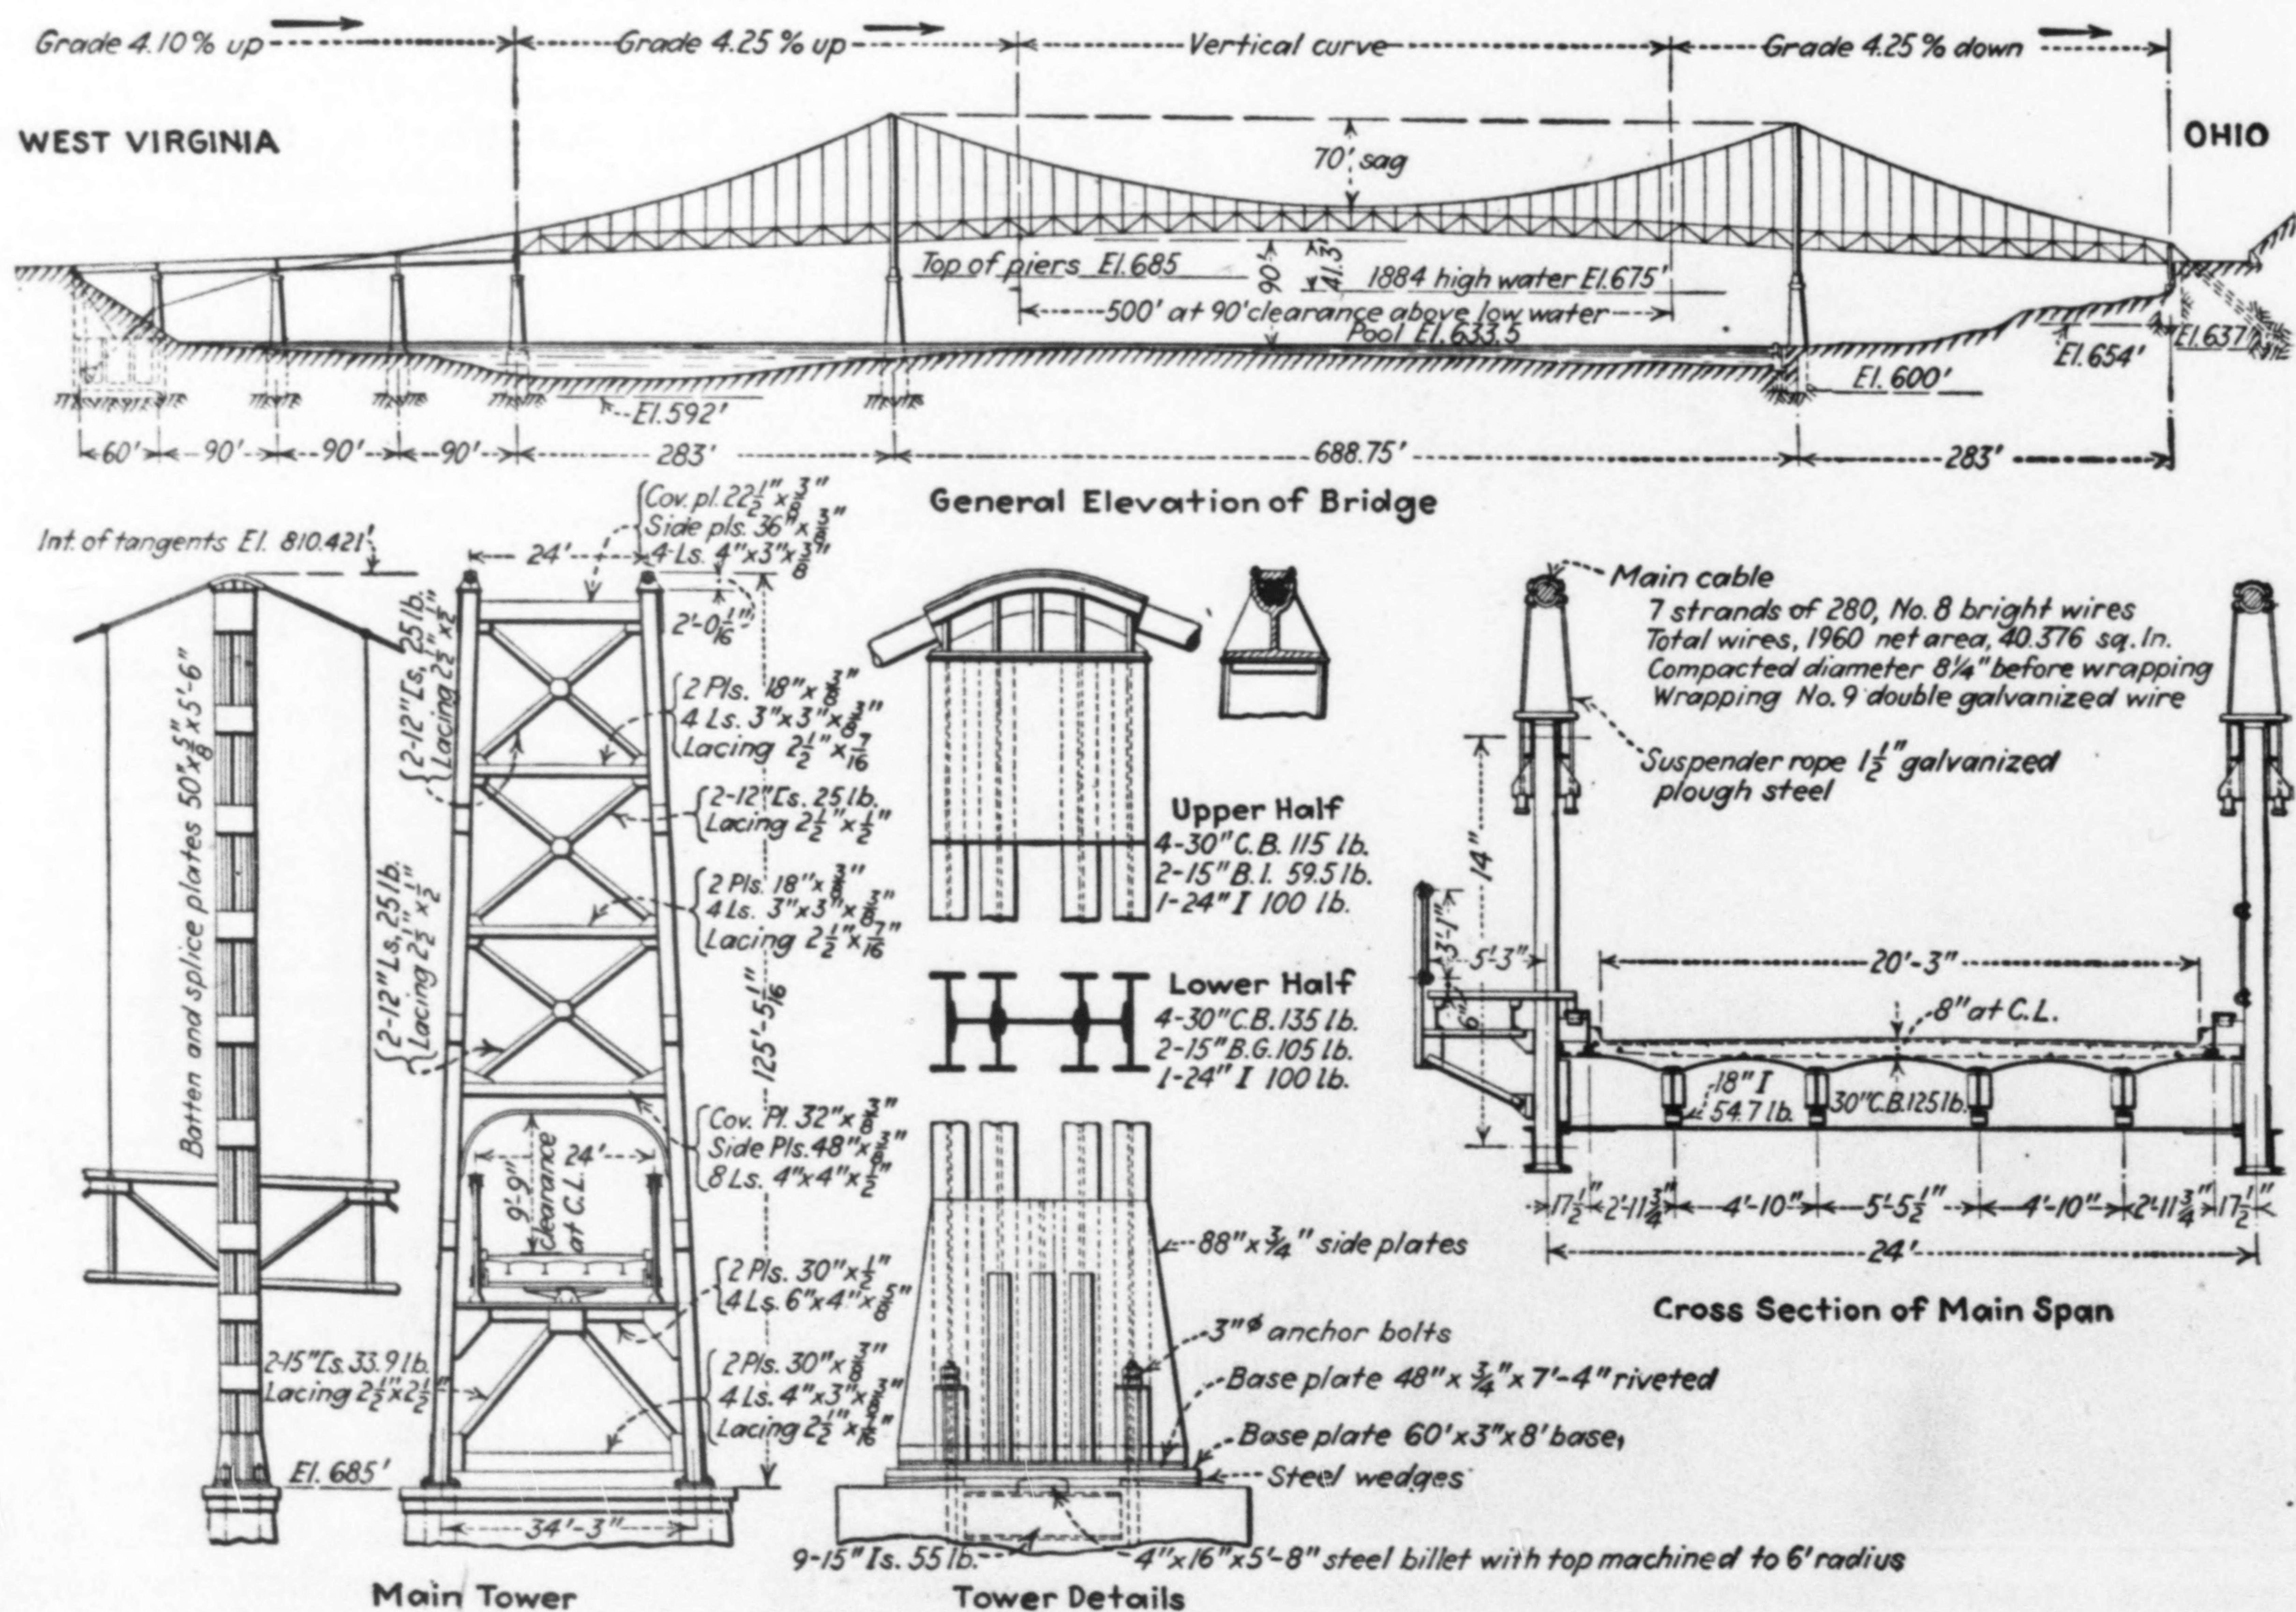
DETAILS OF FORT STEUBEN SUSPENSION BRIDGE
